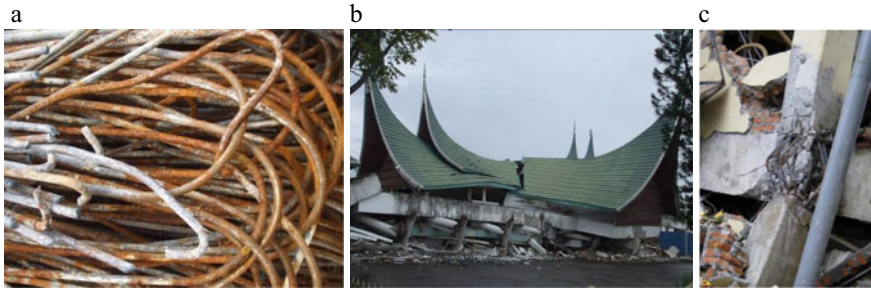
Deficiency in reinforcement and typical collapse mode. a Smooth plain bars used as main reinforcements (found in a collapsed shophouse) at Padang city, b soft-storey collapse of the Public Works Building at Padang city, c lack of transverse reinforcement in beam–column connection
